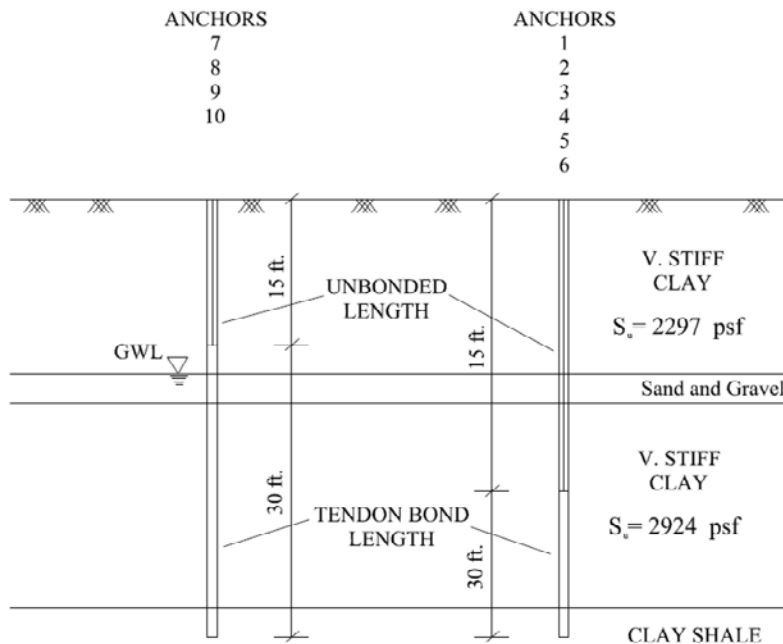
Stratigraphy and Anchor Specifications for Existing Anchors (after Briaud et al., 1998a).
